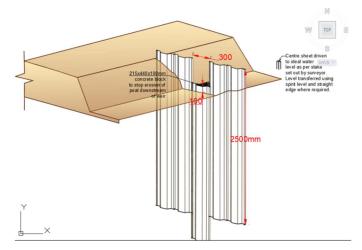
Weir to be constructed (snip from drawing PCAS-0100-021).
